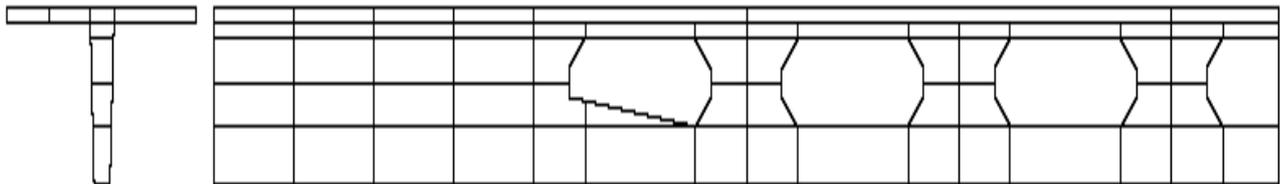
Savage et Al .The Beam – Mesh refinement 56 brick element.
